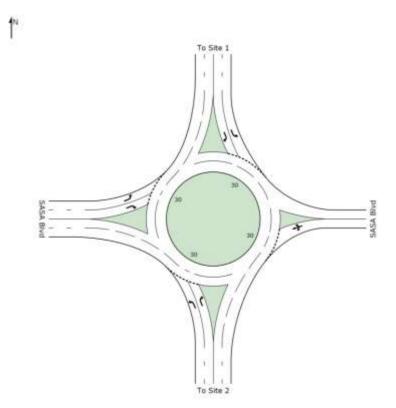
Future layout of SASA Boulevard Roundabout A
